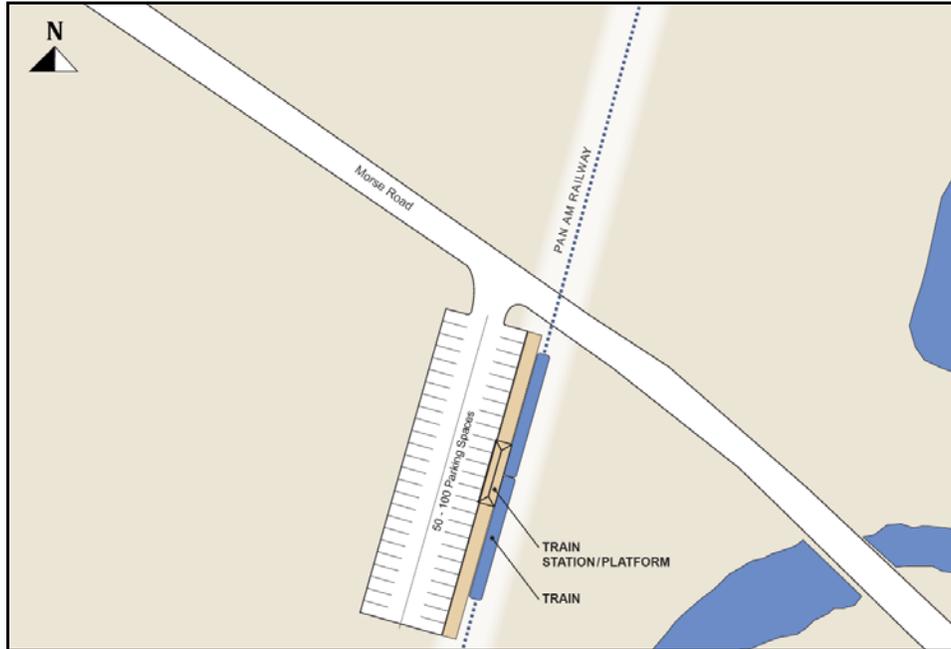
Pinelands West Station and Parking Layout (Pan Am Route)
